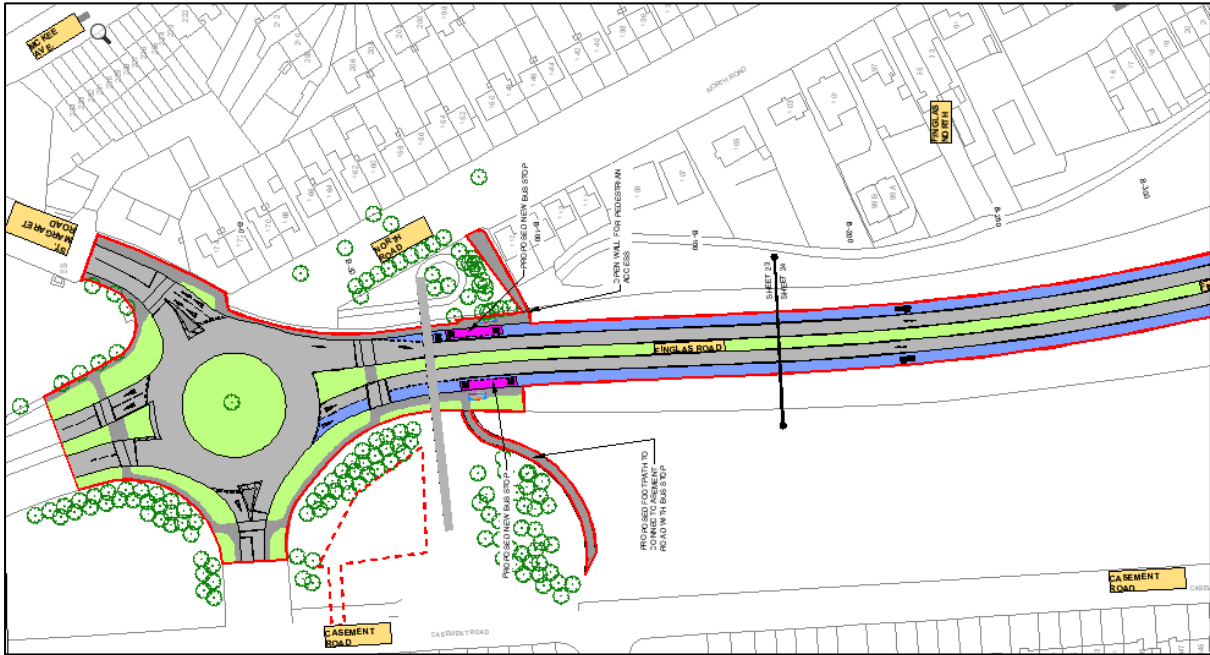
Extract from General Arrangement Drawing Sheet 23
